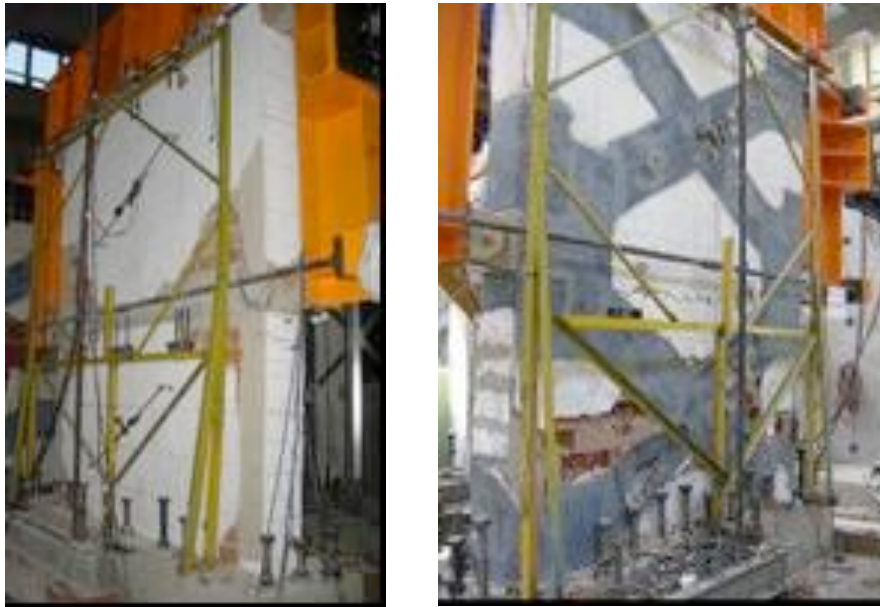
Damages of specimens IL-0-1-17 and IL-C1-1-8.6
